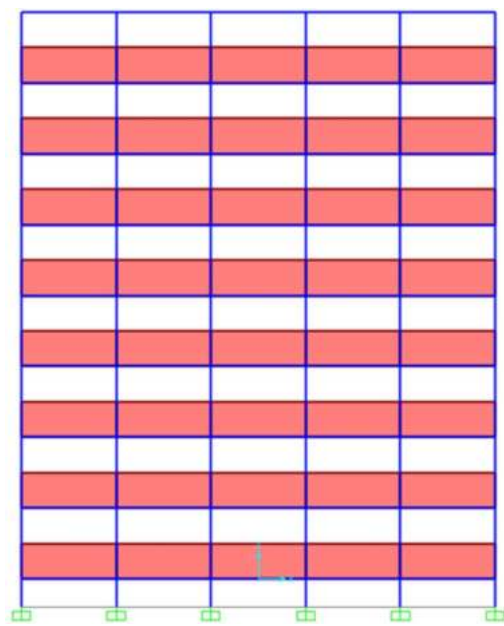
Elevation of 50% Partially in-filled frame with composite column
